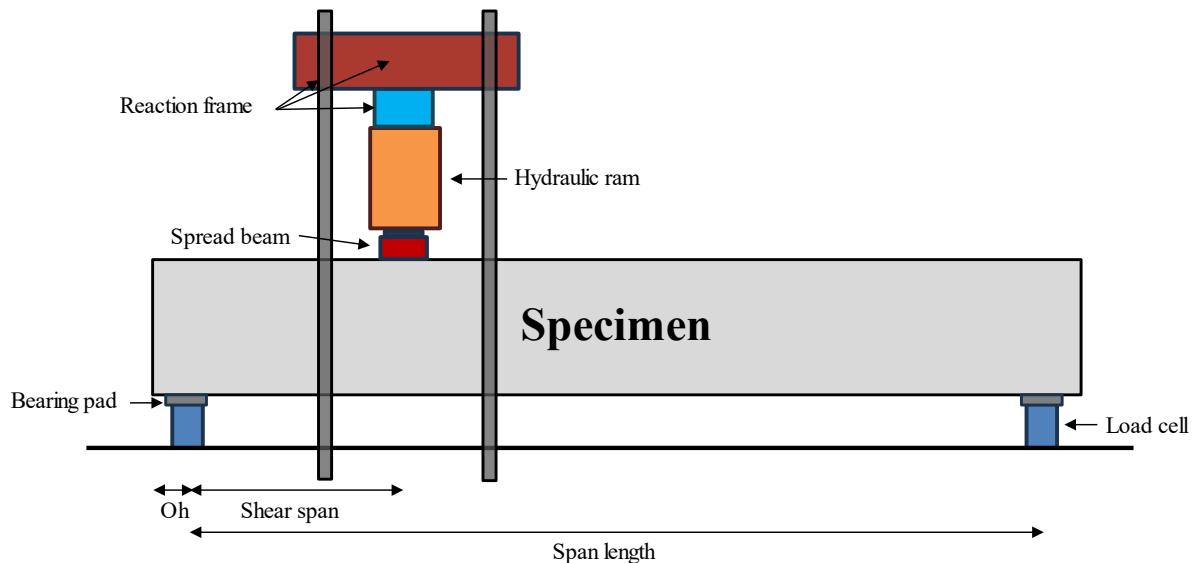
Side elevation view of the test setup of the prestressed girder
